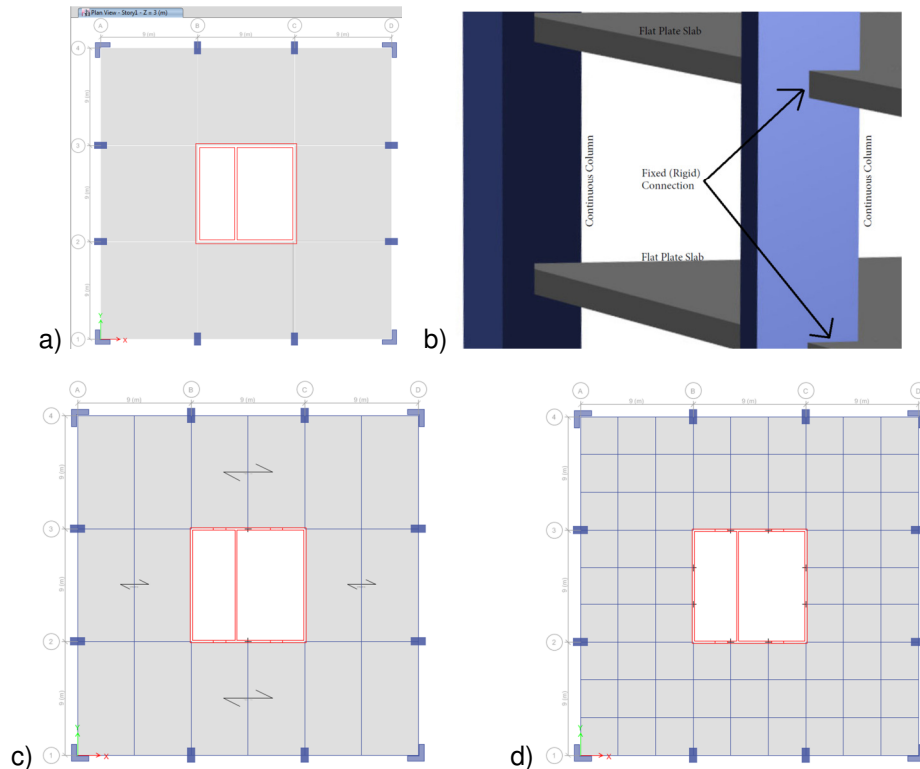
a) Concrete building: typical Floor layout level 1-30; b) Column – Slab rigid connection; c) CLT floor layout Hybrid buildings 1-way and d) 2-way
